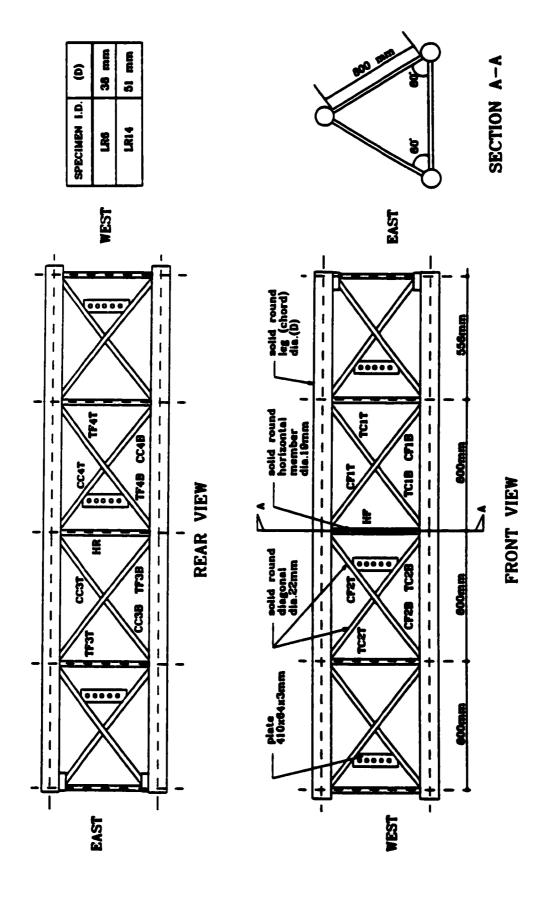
Dimensions of Specimens LR6 and LR14
